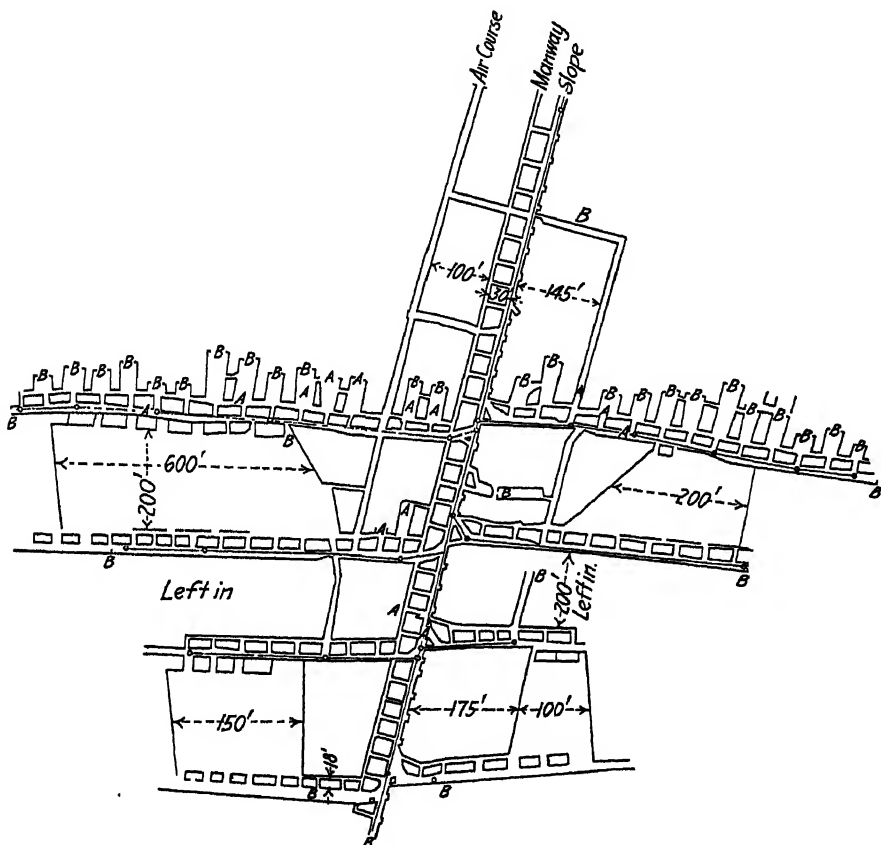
SEMI-LONGWALL MINING IN A THICK STEEPLY PITCHING SEAM.
